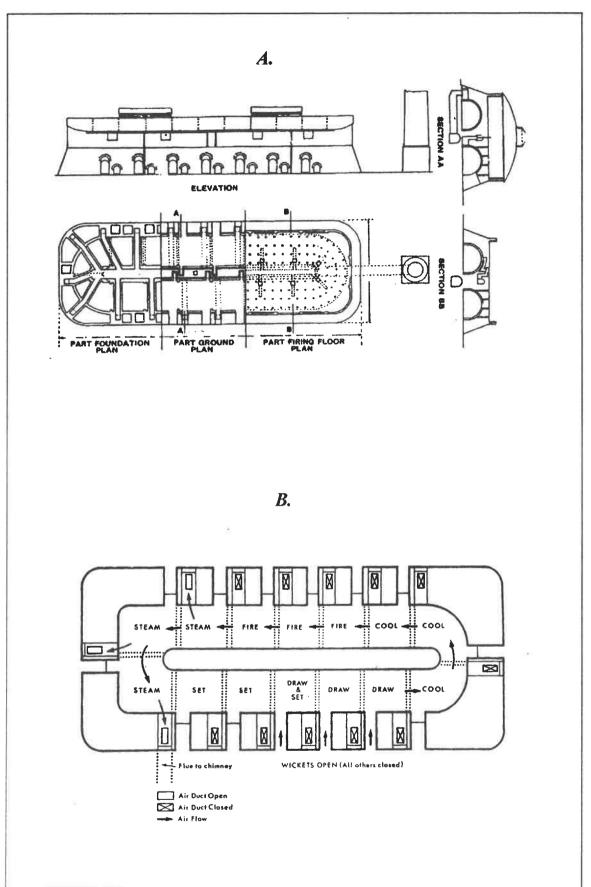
The 'Hoffman' brick kiln. A) Elevation and cross sectional ground plan of typical 16 chamber 'Hoffman' kiln, 1890-1960 (HAMMOND 1981) (note chimney stack to the side). B) Ground plan of 14 chamber Hoffman kiln showing firing process and air flow, c. 1894 at Forder's Brickwork's, Westonig, England (note chimney stack at front) (RCAHME – COX 1979).
